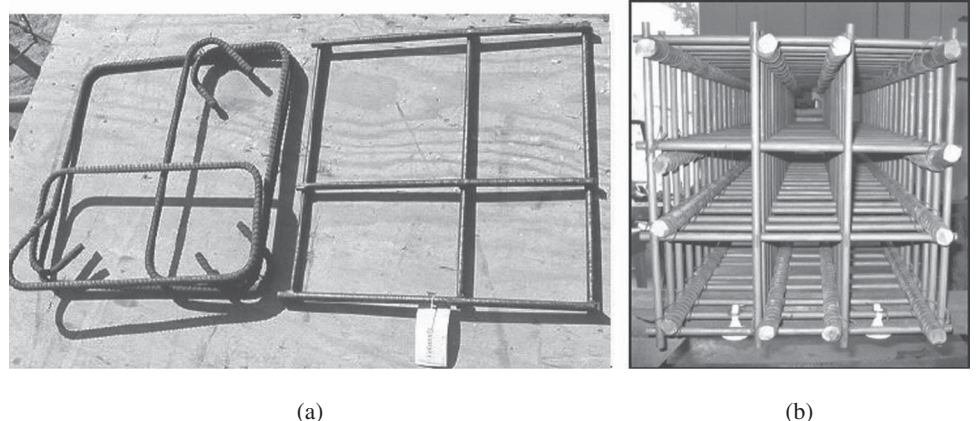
Transverse reinforcement in beams/columns (a) Conventional and welded reinforcement grids (b) Better constructability of column with BauGrid® WRG™
